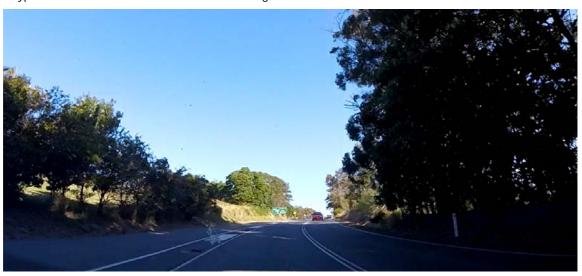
Turnock Street Typical Section North of Cudgen Road (southbound)
